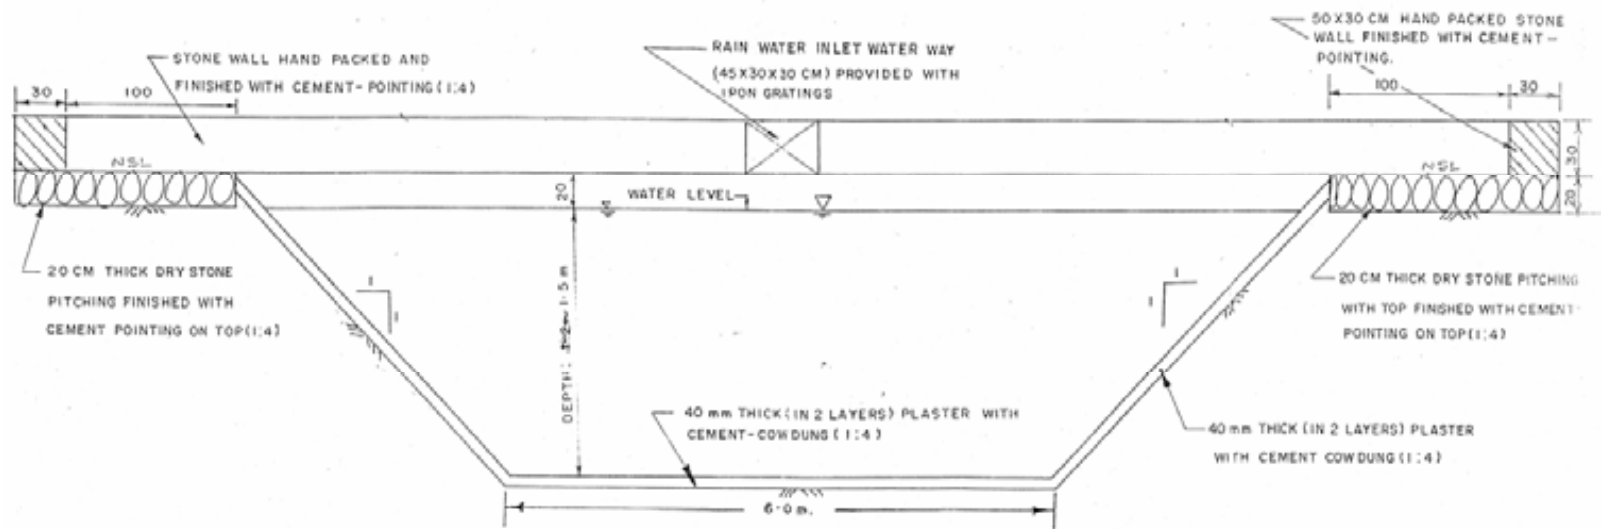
Typical section of small water harvesting pond (6x4m)
